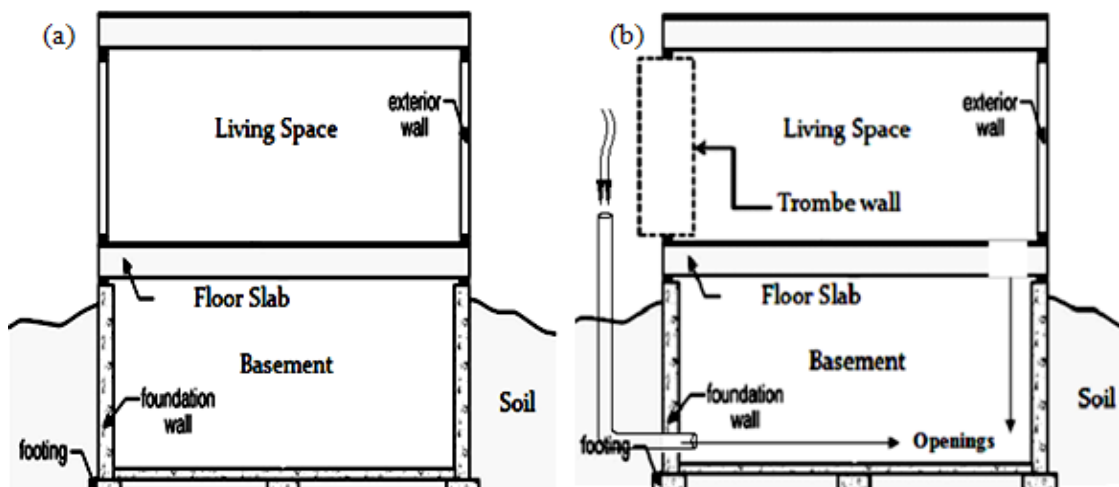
Cross section of an isolated living space with a basement (a) for a typical construction and (b) when integrated with Trombe wall
